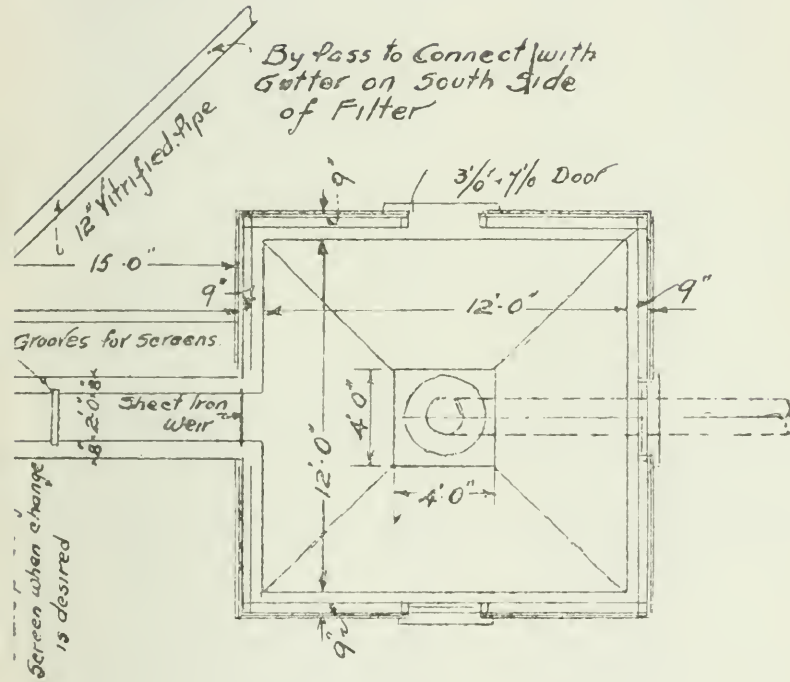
Plan of Multiple Stage Sewage Tank, Type "B"
